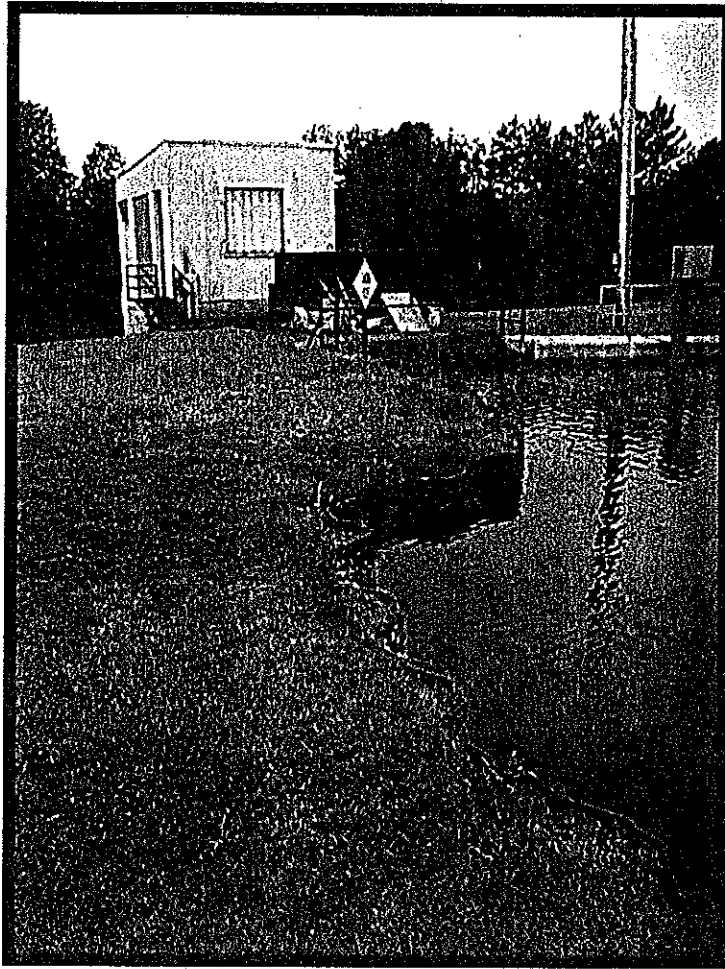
Leak through spillway surface, minor cracking in right retaining wall.
